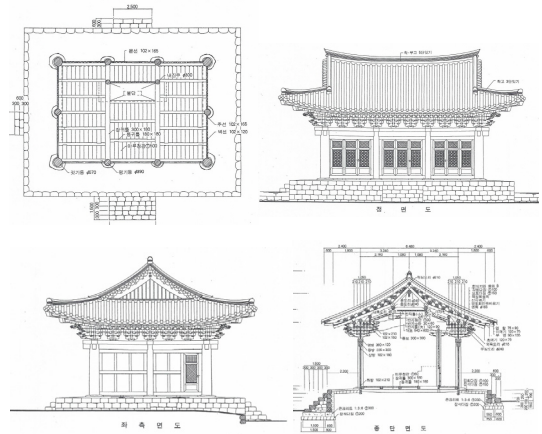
Oeosa Daeungjeon (Plane, Elevation, Side, Longitudinal section)
